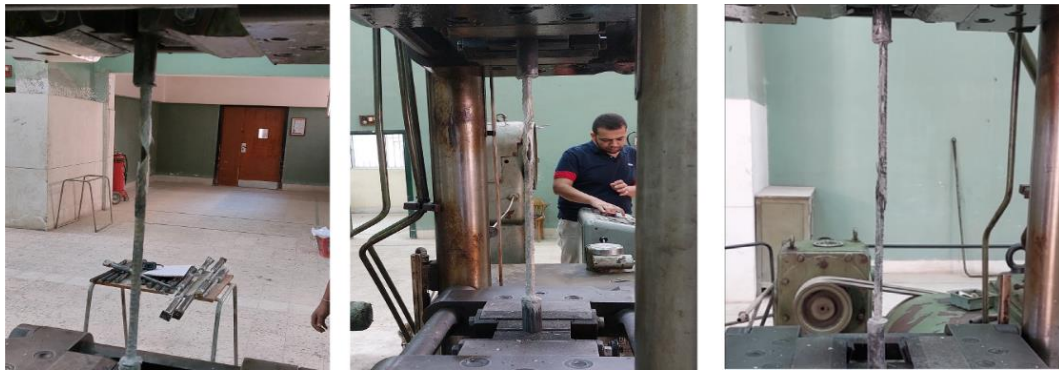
Failure of the hybrid-steel bars tensile test specimen.
